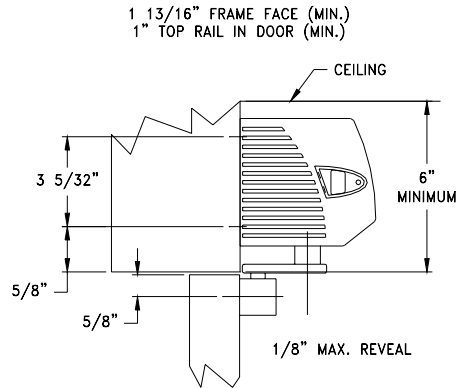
OPERATOR CLEARANCES – PULL ARM
